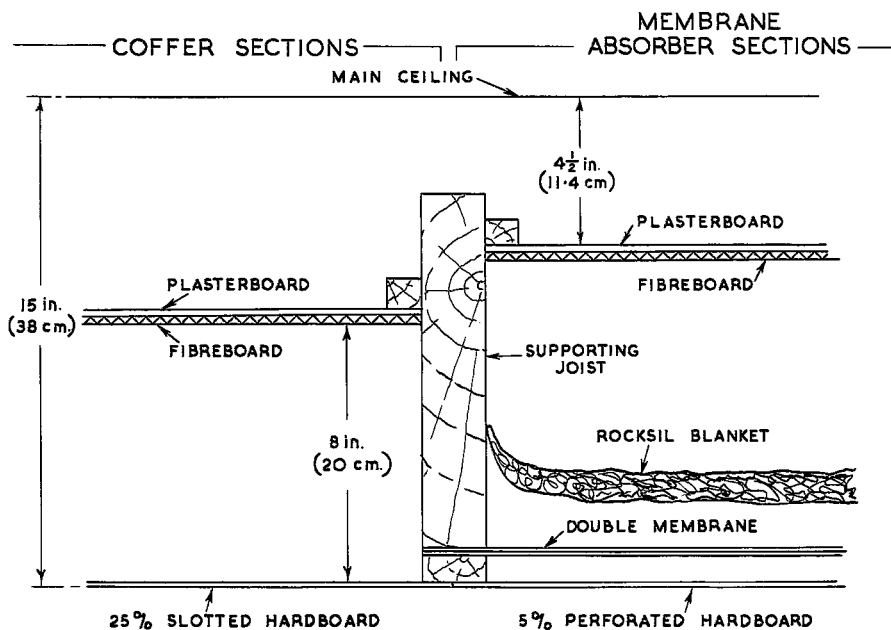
Construction of studio ceilings (after Building Department sketch)
